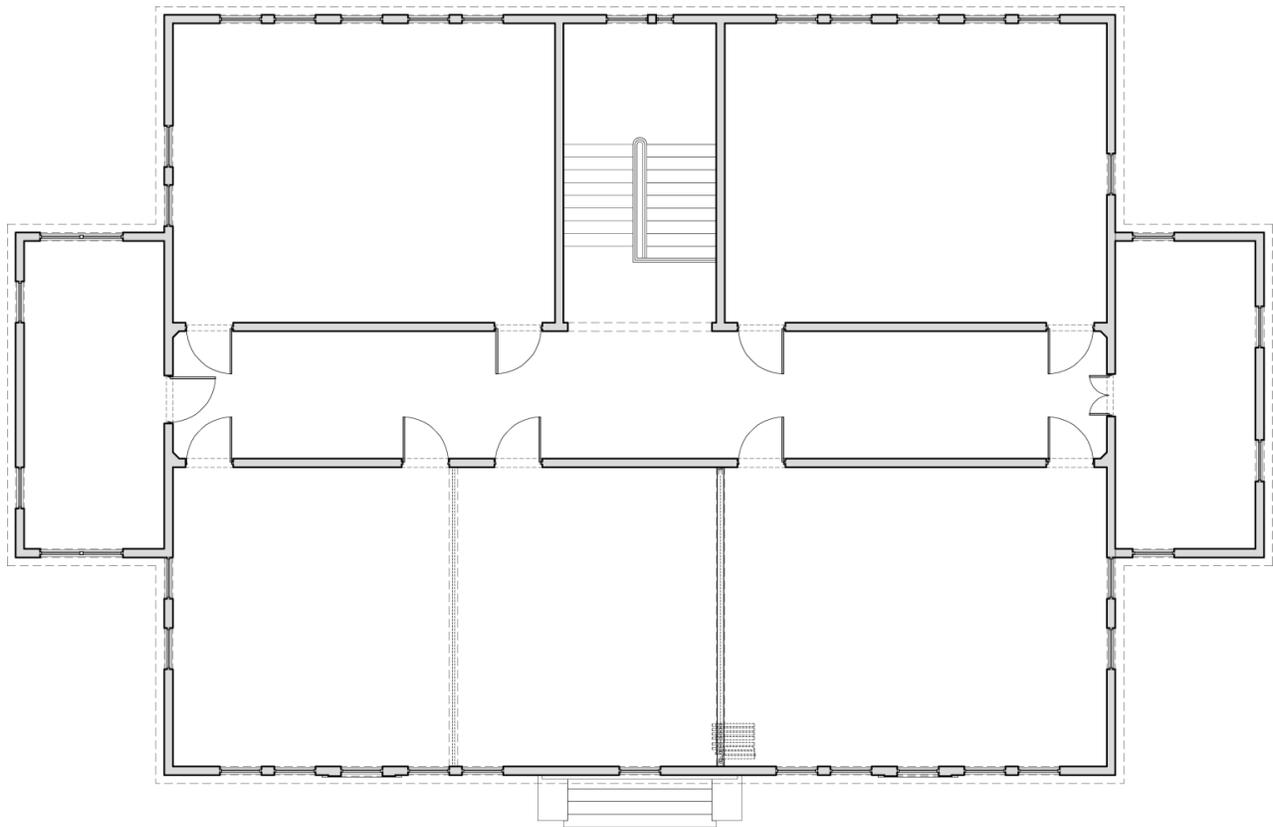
Eugenio María de Hostos School Second Level Floor Plan. Classroom spaces are housed within the main volume, and reached by a T-shaped, double-loaded, corridor; storage space flank the main volume. Facing northeast, two classrooms and principal's office on the second floor were provided with folding door partitions, so that they could easily be converted into a large assembly room. Drawing: Eduardo Miranda, September 19, 2012.
